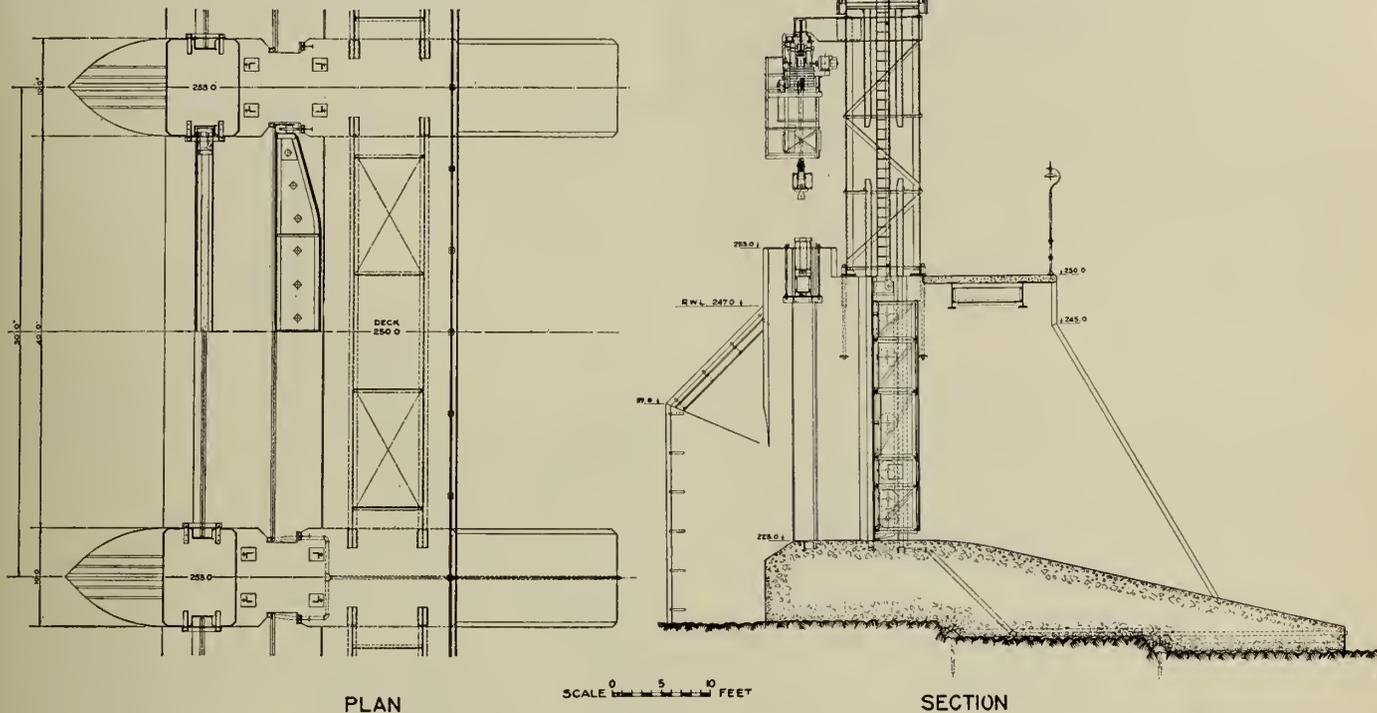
Plan and Section of one 40-foot sluice gate showing Operating Mechanism and Monorail Hoist.
